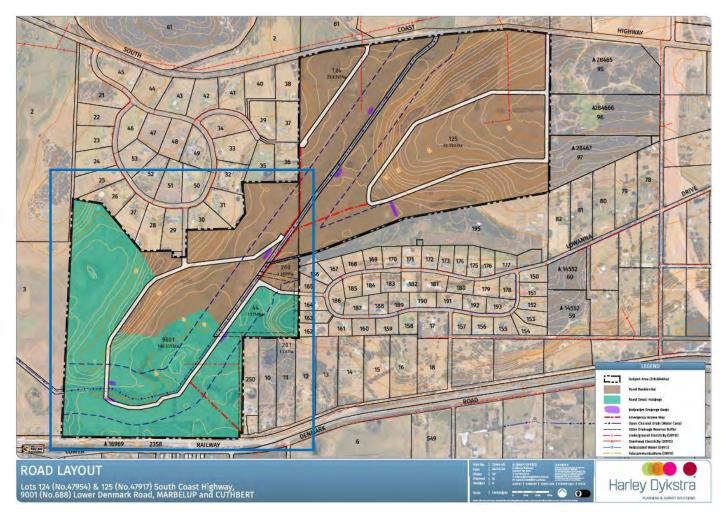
Zoning plan concept plan (Harley Dykstra, 2024). Note Subject Site area depicted by blue square.
